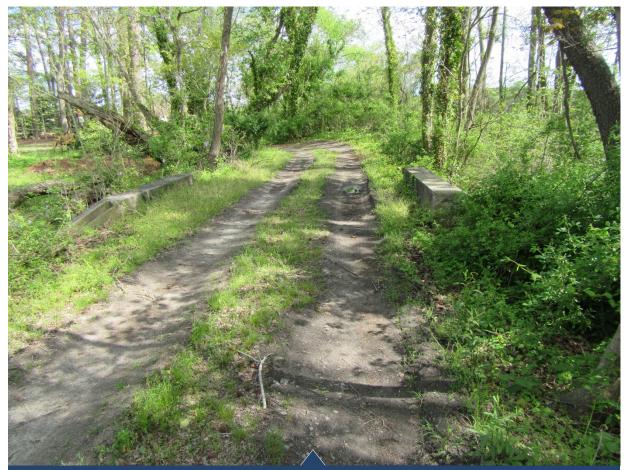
A culvert that formerly carried the railroad remains and provides an option for the crossing of Old Plantation Creek
